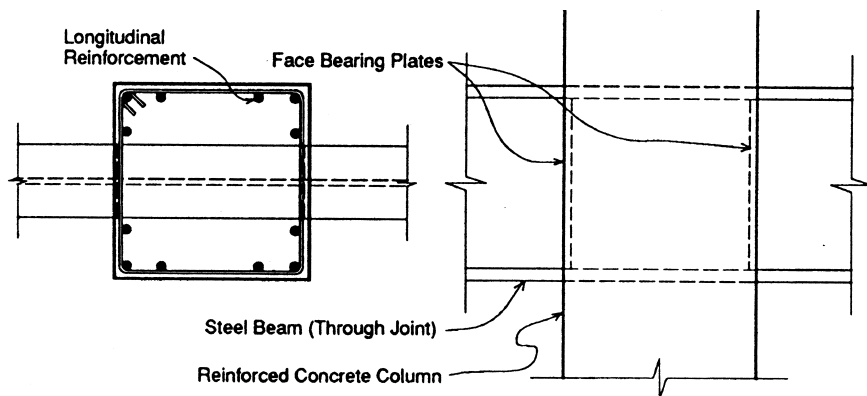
Reinforced concrete column-to-steel beam moment connection.
